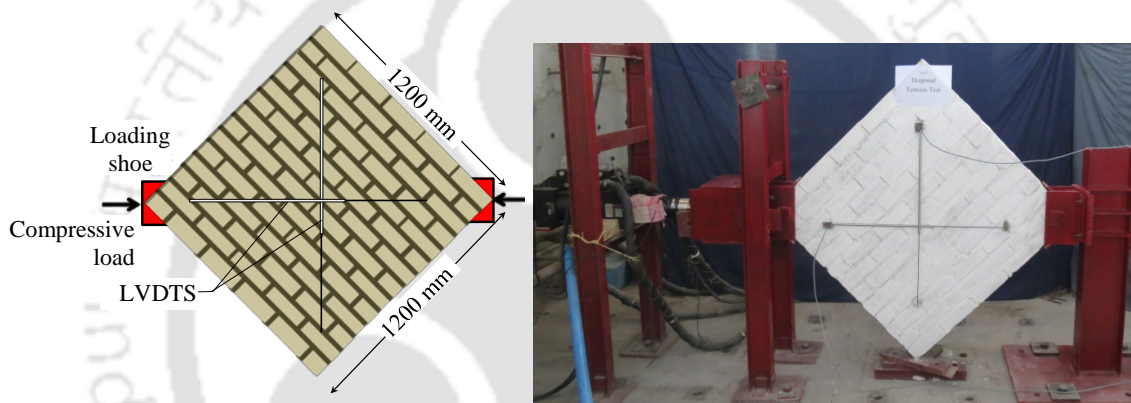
Diagonal compression test up for full-scale masonry wallettes (1200×1200 mm).
